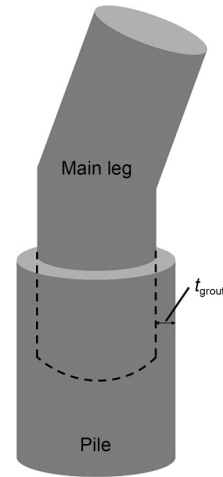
Schematic diagram of the grouted connection between the upper jacket structure and the pile
